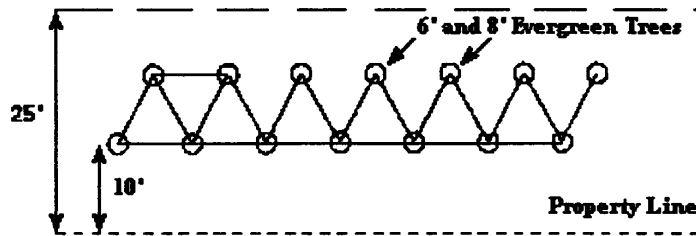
C Tree Planting Detail - Plan View (Broken Rows)
